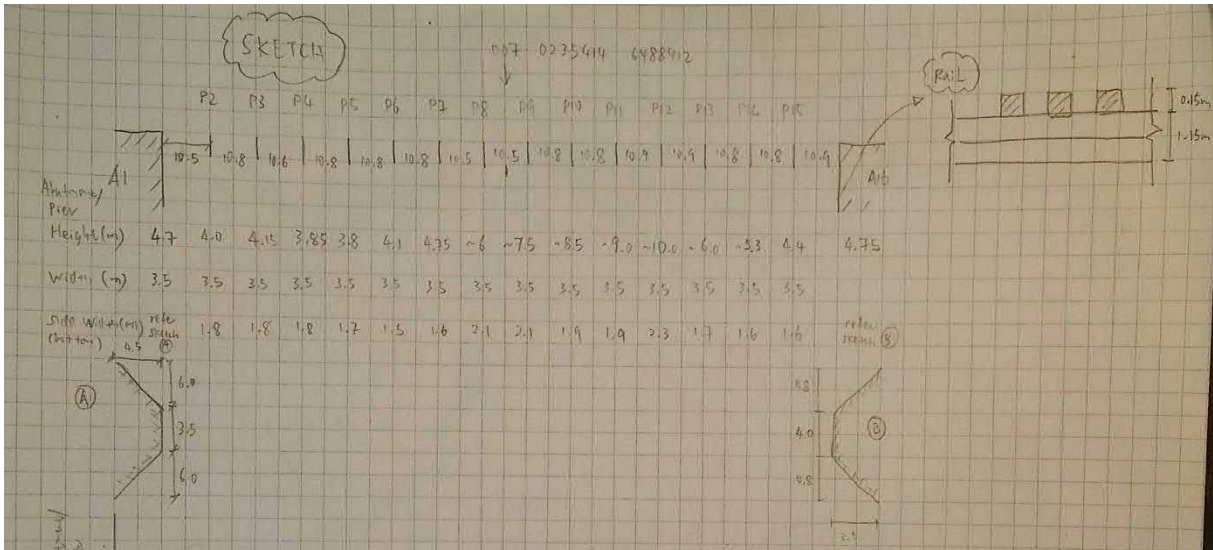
Structure at GPS point 013 (Site Note 2.jpg)
